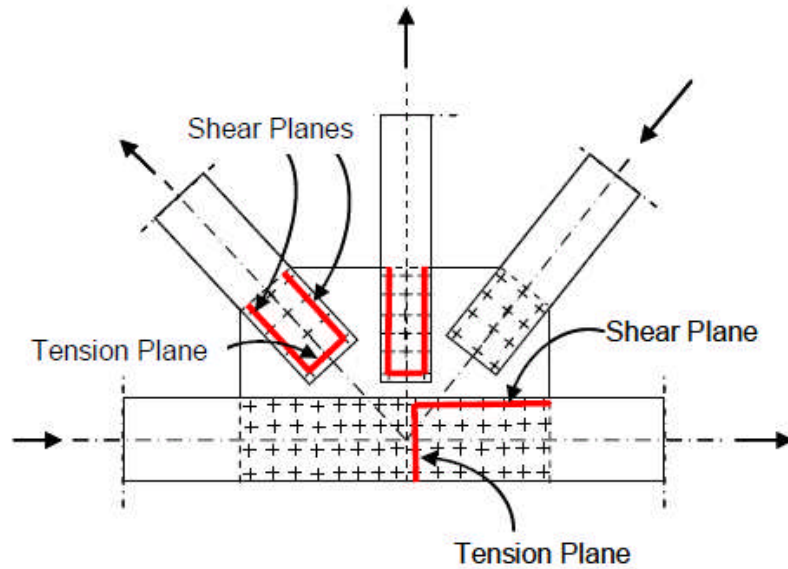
Potential Block Shear Rupture Planes for Gusset Plates in Tension
